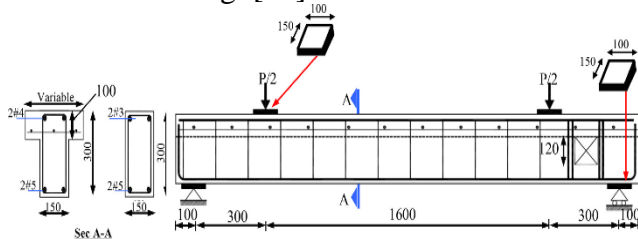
Beams geometry and details of reinforcement (all dimensions are in millimeters)[41].
